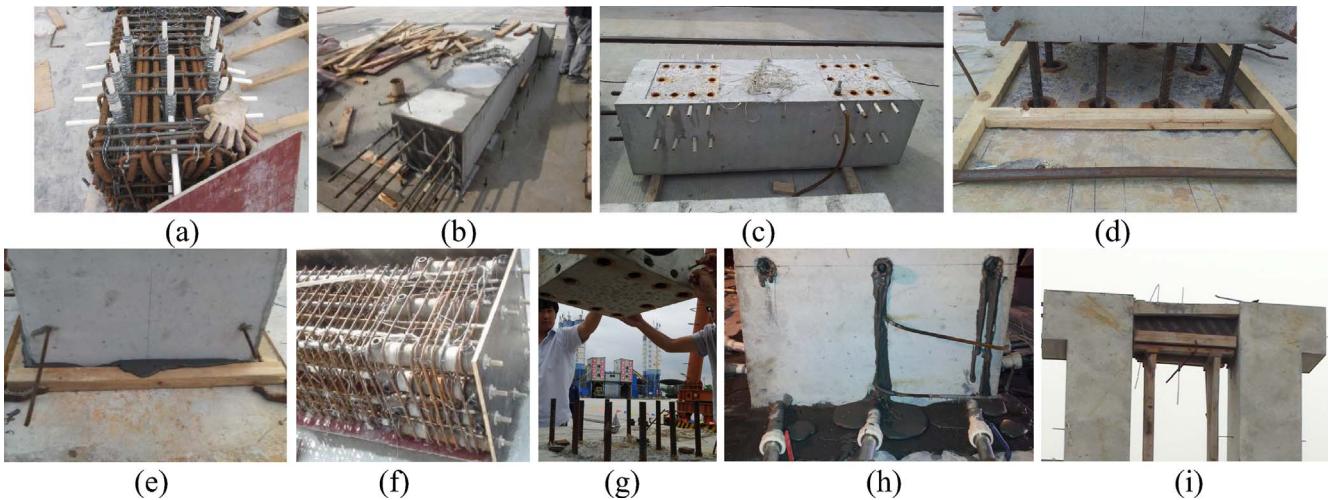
Photographs during construction: (a) Reinforcement cage of cap beam for specimen #1; (b) precast column after removing mold (specimen #1); (c) precast cap beam of specimen #2; (d) assembly of column to footing of specimen #2; (e) column-footing grouting of specimen #2 (f) column reinforcement cage of specimen #3; (g) assembly of column to footing of specimen #3; (h) grouting of specimen #3; (i) on-site casting of tie beam.
